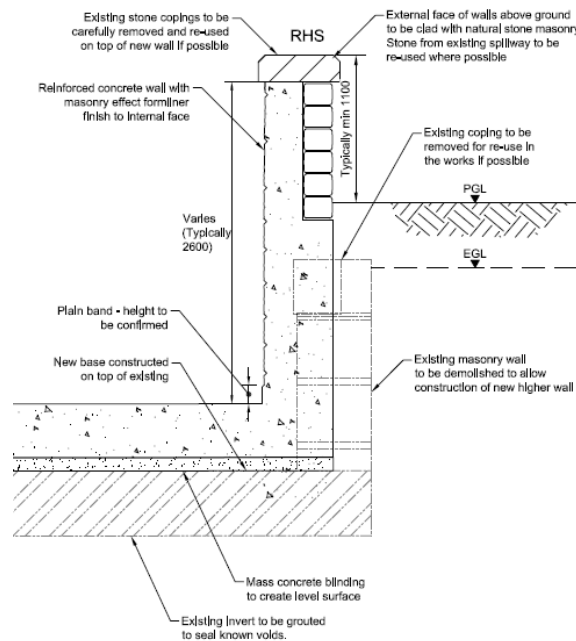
Extract from drawing PR02-07-230 (P1) Proposed new spillway wall section (Original Planning Submission)
